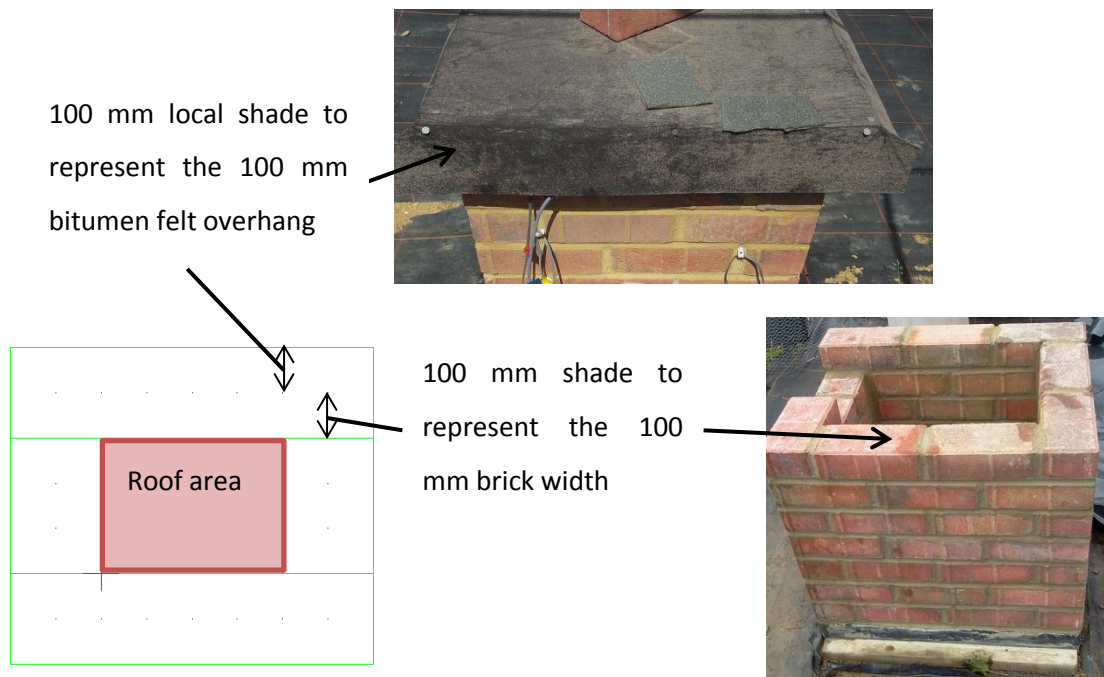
Plan view of bare cuboid from IES, showing shading (green outline) around the roof area (pink), with accompanying representation on photographs of the experimental brick cuboids
